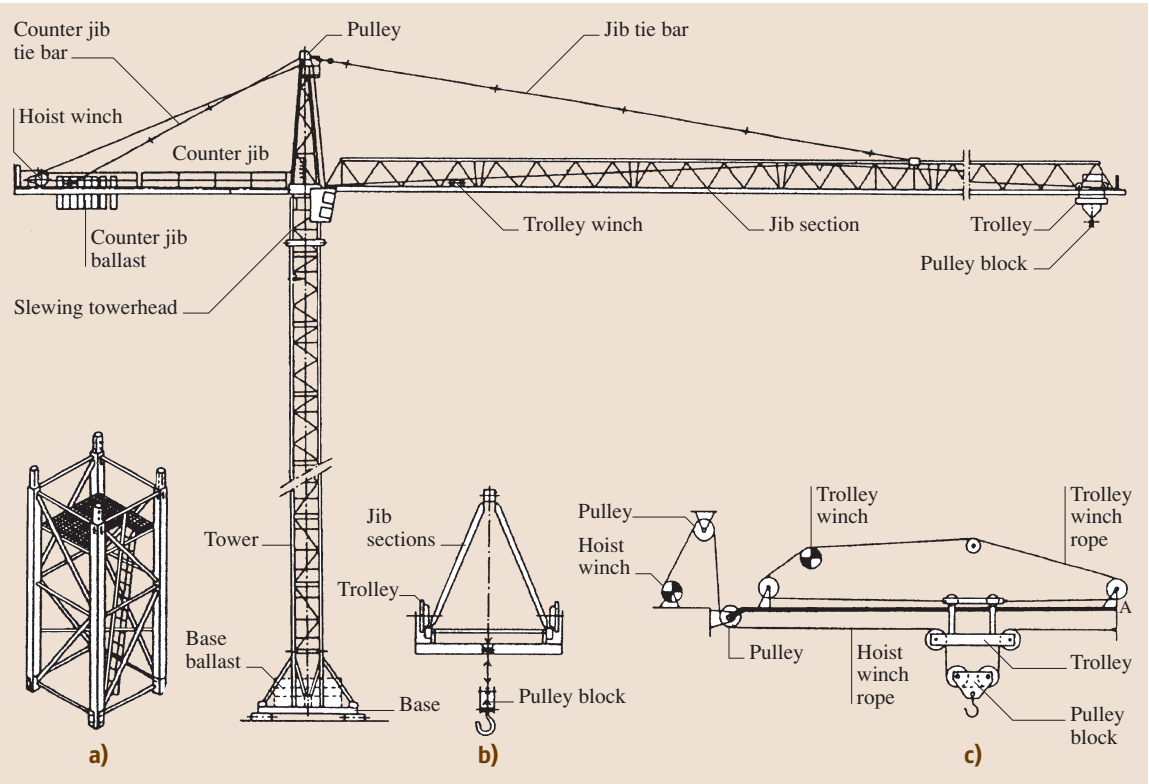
c Tower crane with trolley jib – main parts. (a) Tower’s section. (b) Jib and trolley’s cross section. (c) Kinematic diagram of trolley and pulley block winch hoist drive
